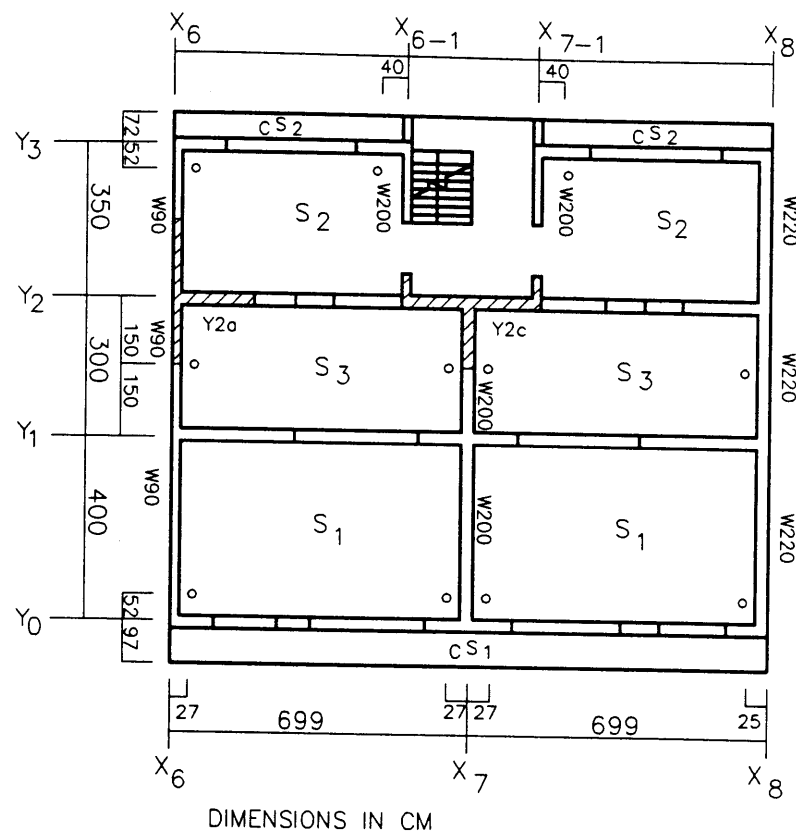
Plan View of Full-Scale Bearing Wall Test Structure
